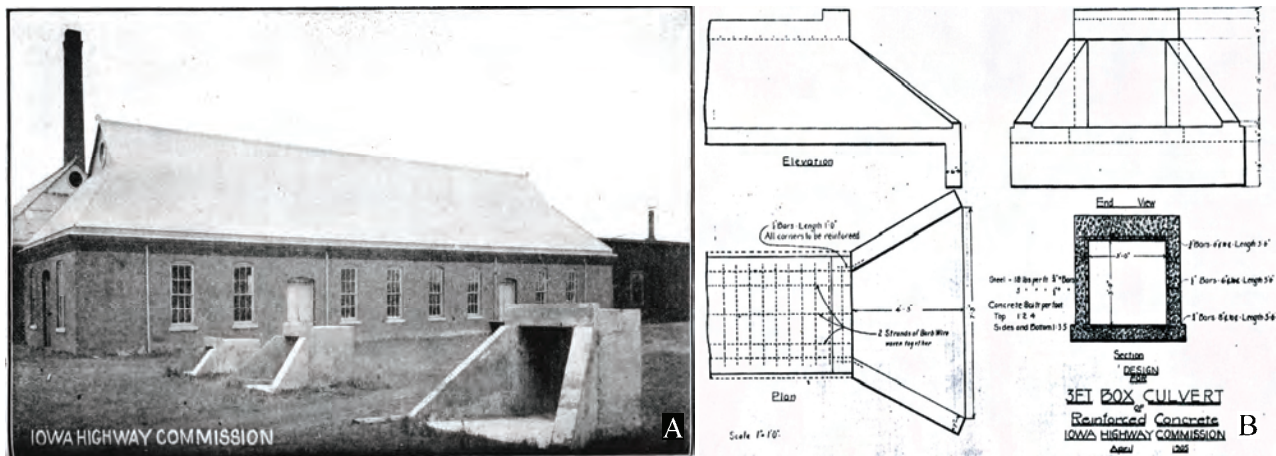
A. Newly introduced precast concrete culverts exhibited along the ISHC building in Ames (ISHC 1905c:30). B. Plan of 3 ft reinforced box culvert (ISHC 1905b:30).
